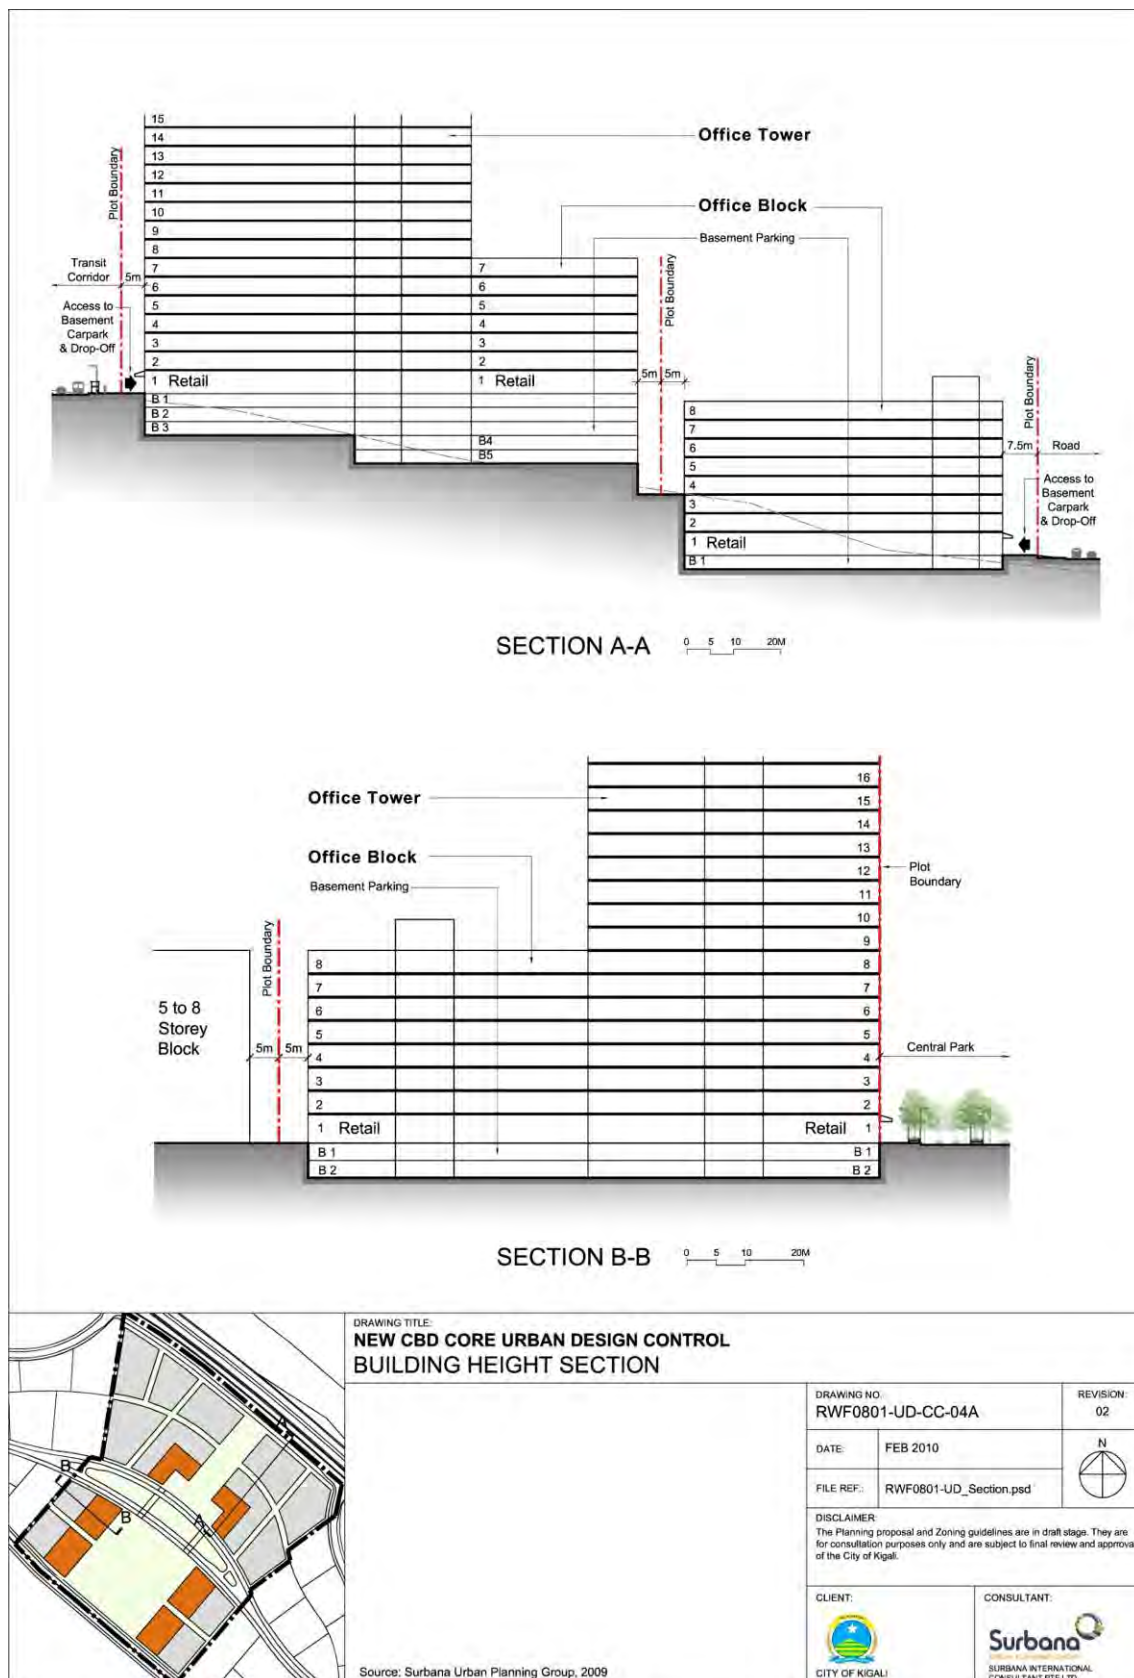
New CBD Core Urban Design Control Building Height Section.
